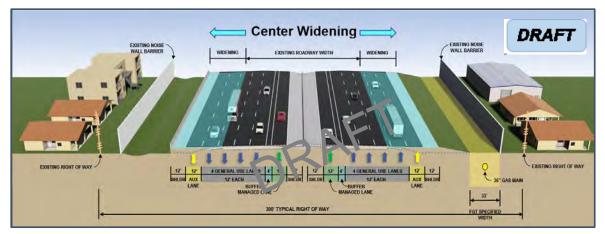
Proposed Typical Section (South of I-595 to South of Atlantic Boulevard)
